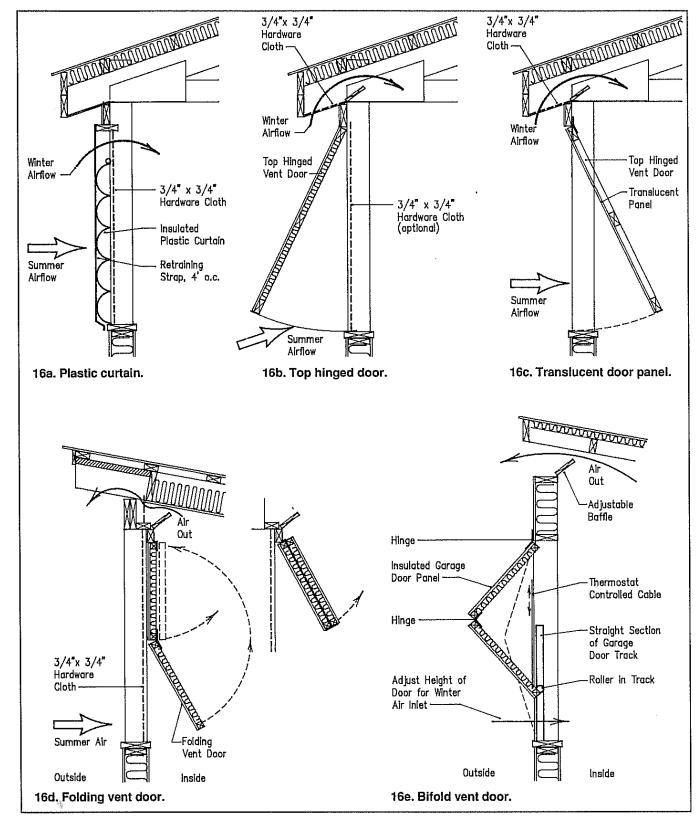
Sidewall openings for modified environment building. See also Fig 15b. Buildings are insulated.
